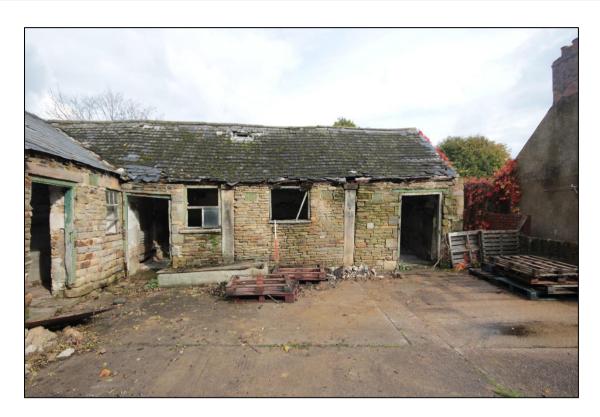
The internal west elevation of the farmyard complex of buildings, featuring plinths from previous shelter shed, with 1m scale.
